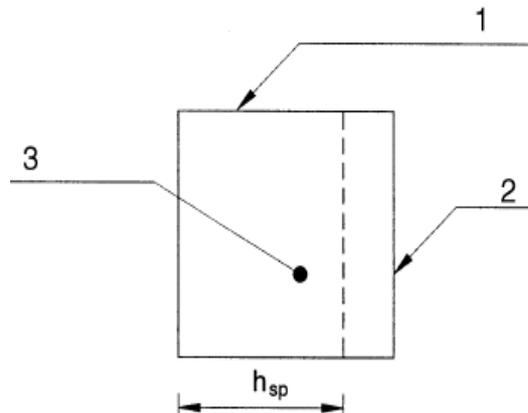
Cross section of bending specimen with notch [23]. 1: Top surface during casting. 2: Notch. 3: Cross section.
